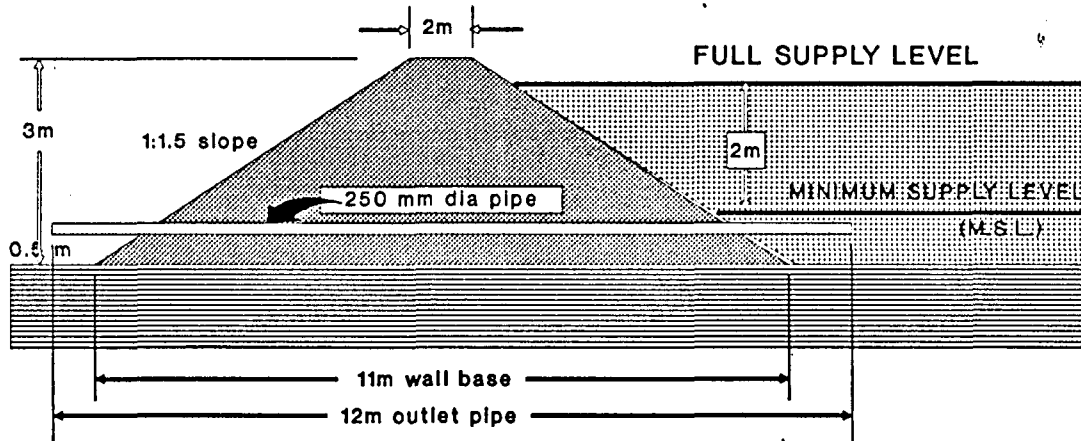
CROSS SECTION OF A TYPICAL BALANCING DAM.
